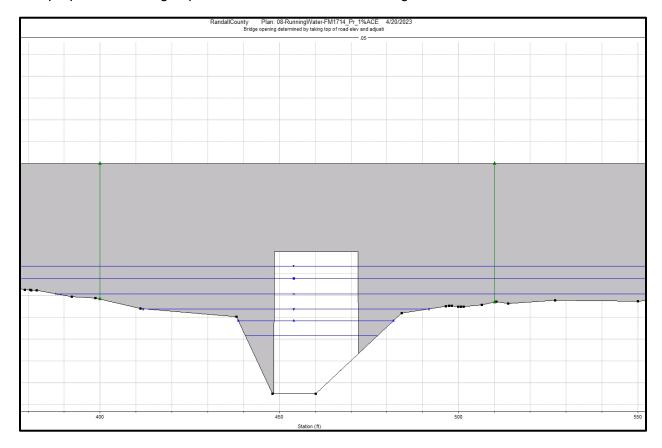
Proposed 1% LOS upstream cross section at Running Water Road and FM 1714 crossing of unnamed tributary to Hackberry Creek.
